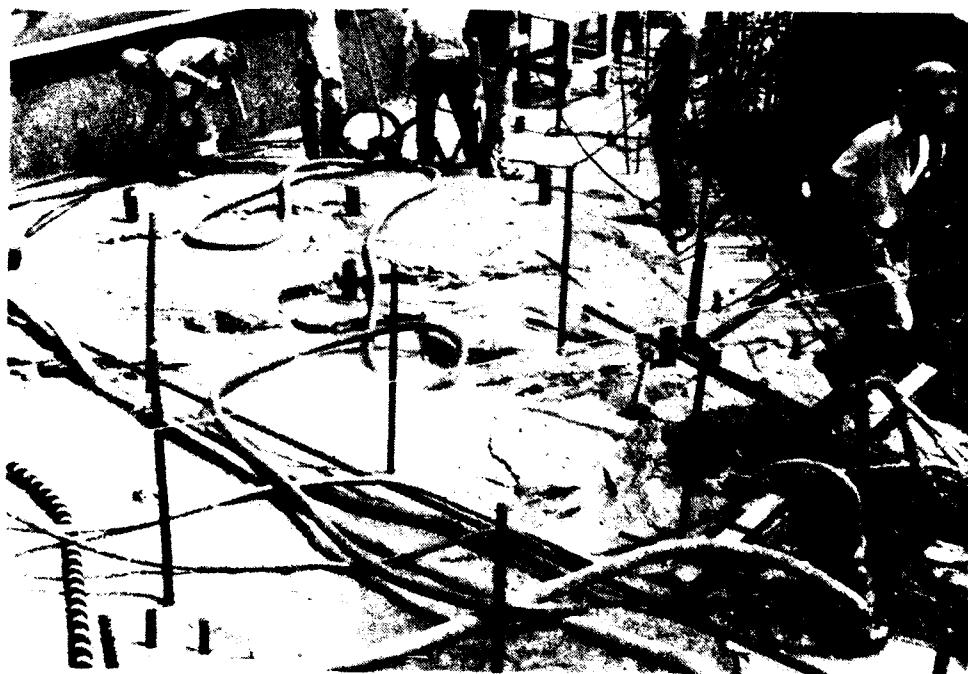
Powerhouse foundation - vicinity of Unit #2 (1982)
